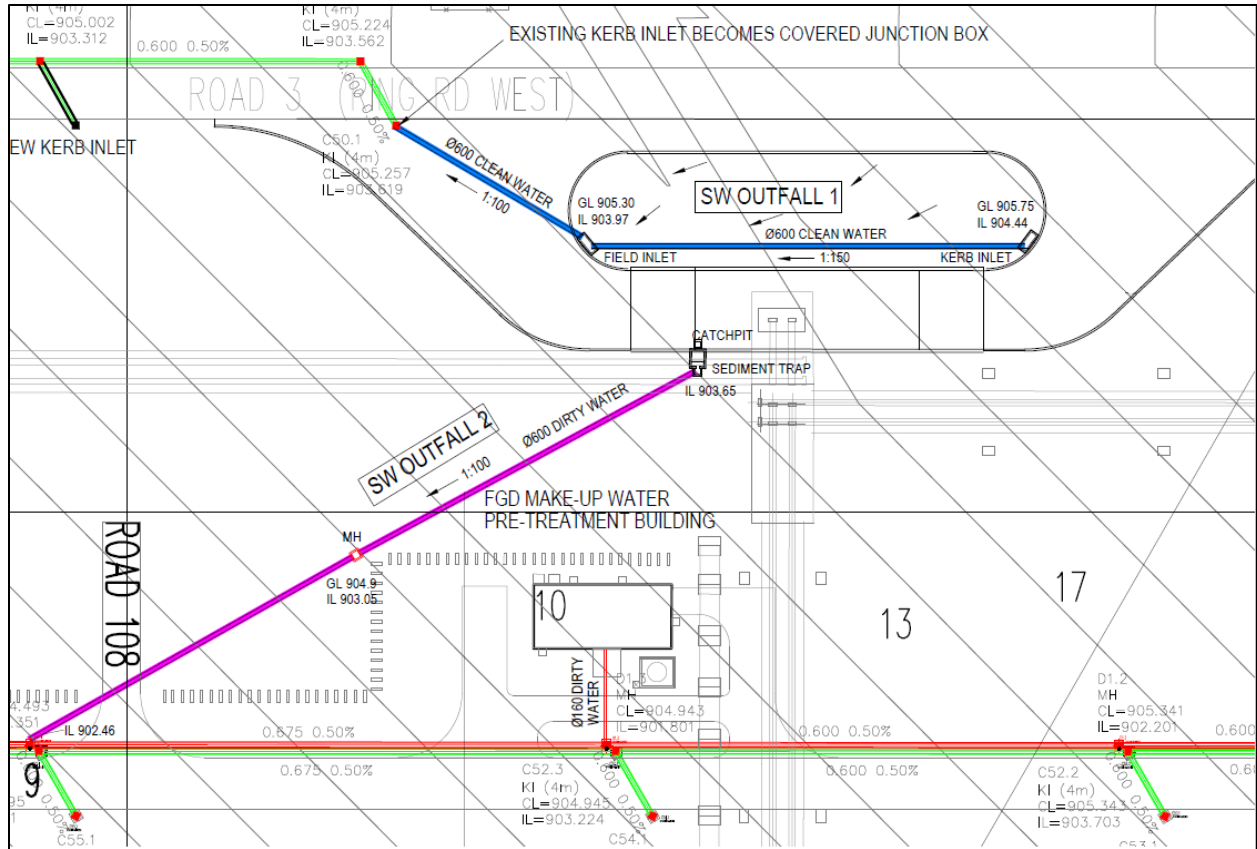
Proposed layout of truck loading facility and associated stormwater management
